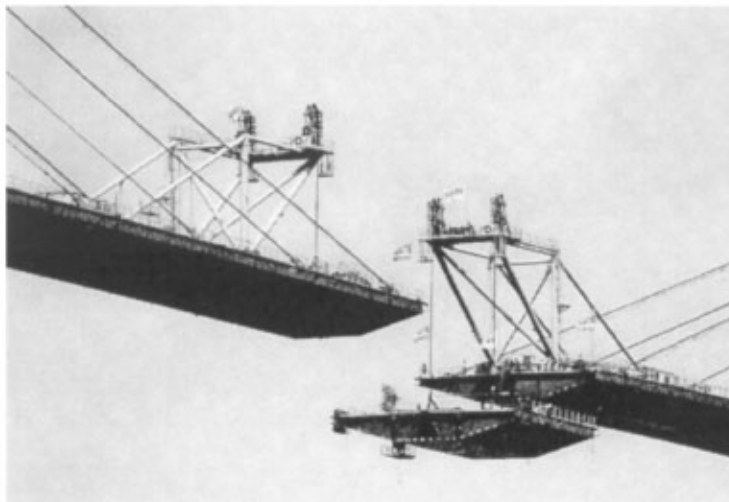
Normandie Bridge, France — lifting of a steel segment.
